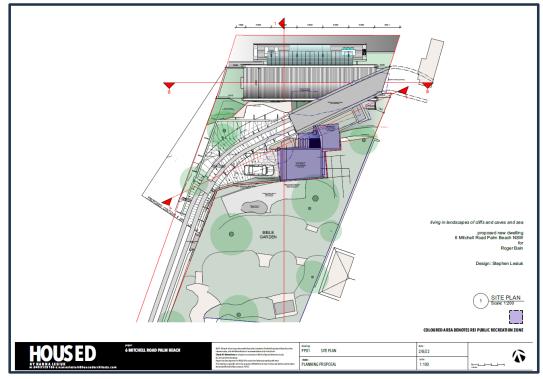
Concept Site Plan with the RE1 zoned portion of the site highlighted in purple (Souce: Housed Architects)
